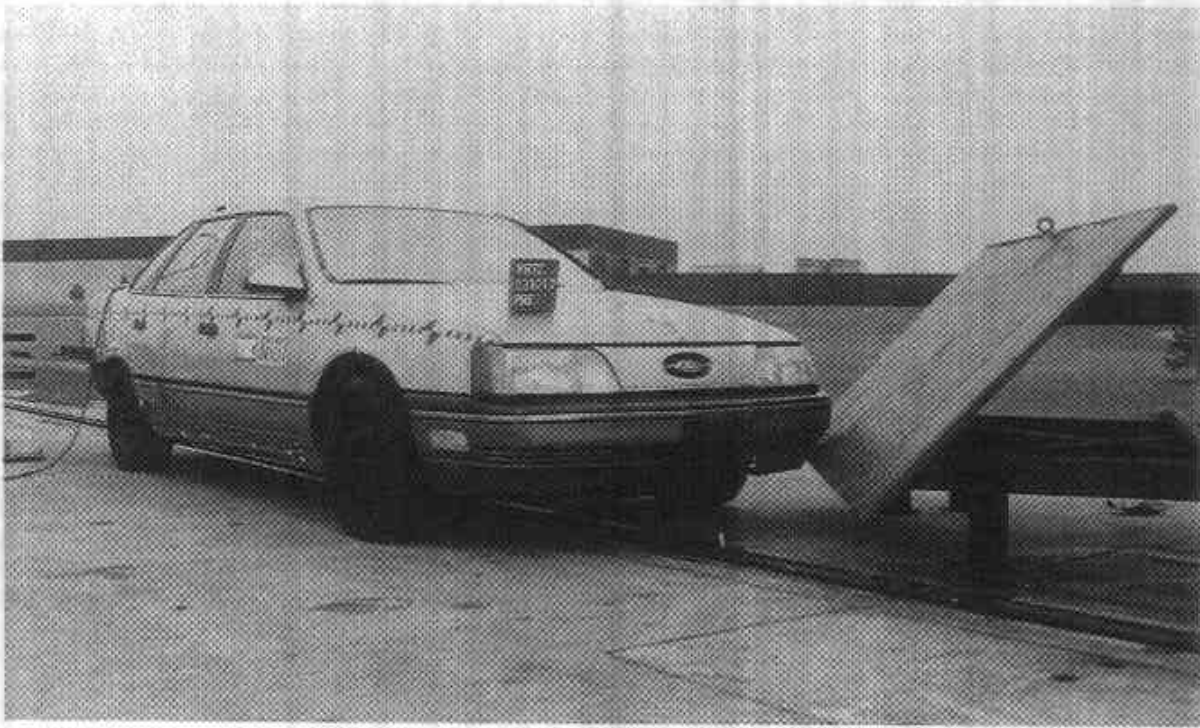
PRE-TEST RIGHT FRONT VIEW
